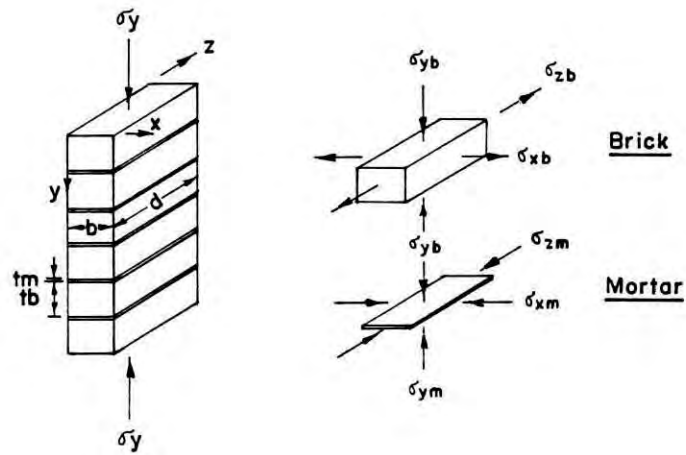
Failure Mechanism of Brick Masonry in Compression after Hilsdorf.<sup>[18]</sup>
